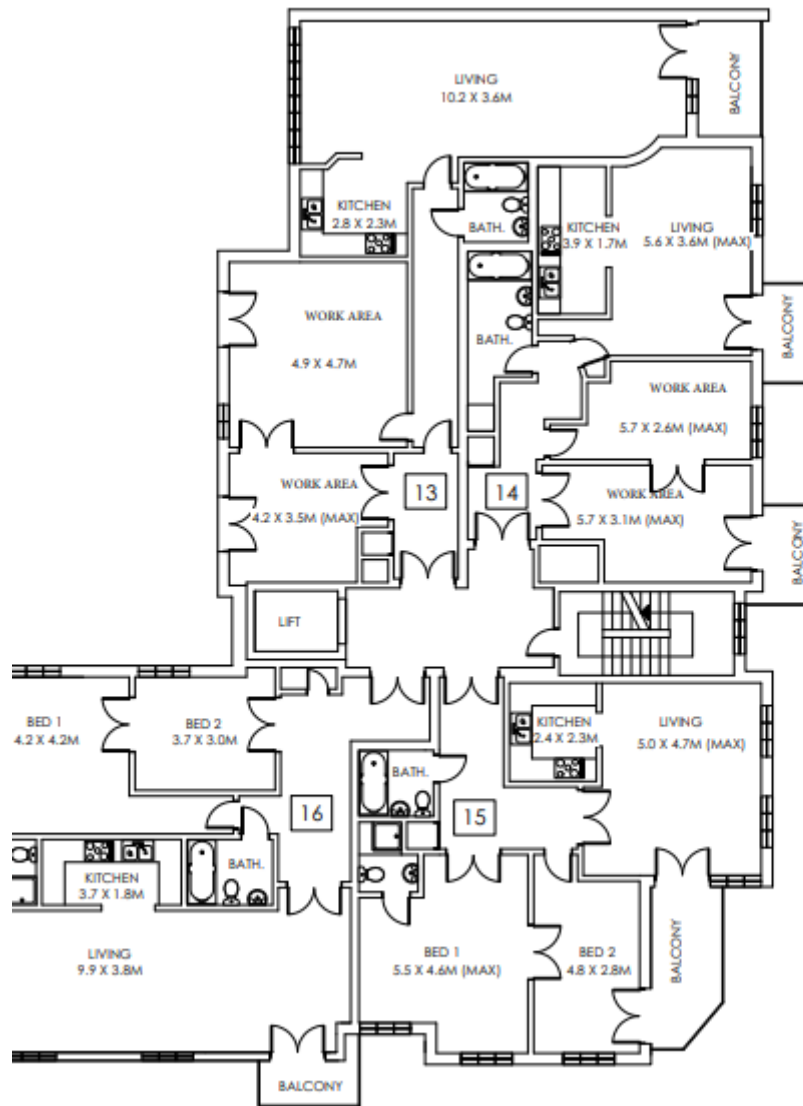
2-4 Artichoke Hill second floor level facing the proposed development (to the right/ east)
